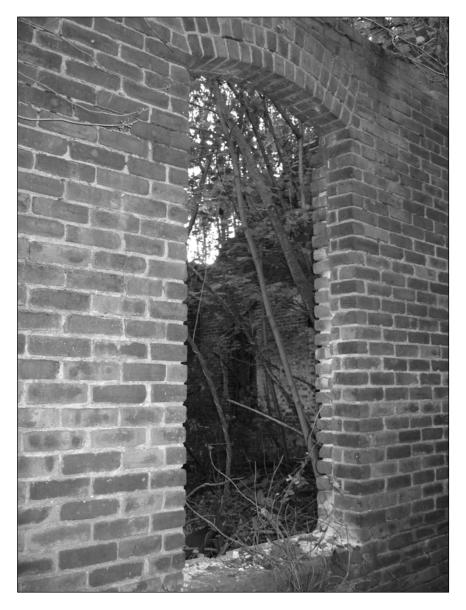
North wing, northern façade of one-story addition, facing southeast.
